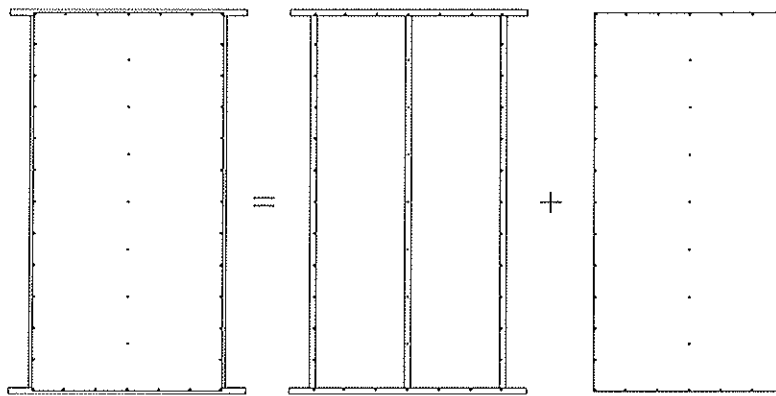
A shear wall unit built up of a timber frame and a sheet.
